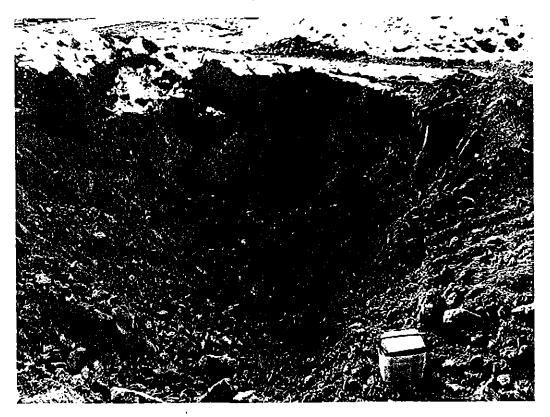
LOOKING SOUTH AT SOUTHEAST EXCAVATION
